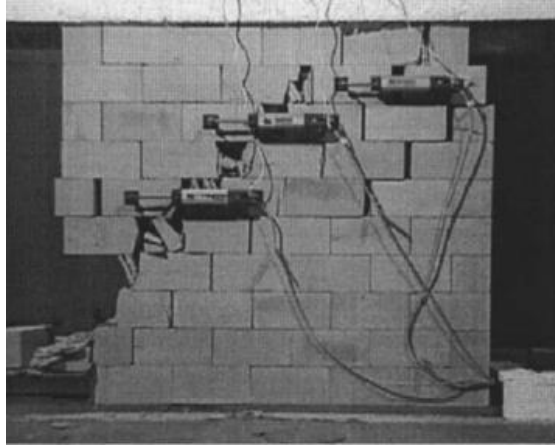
Masonry wall specimen with no opening (Lourenço, 2005)
